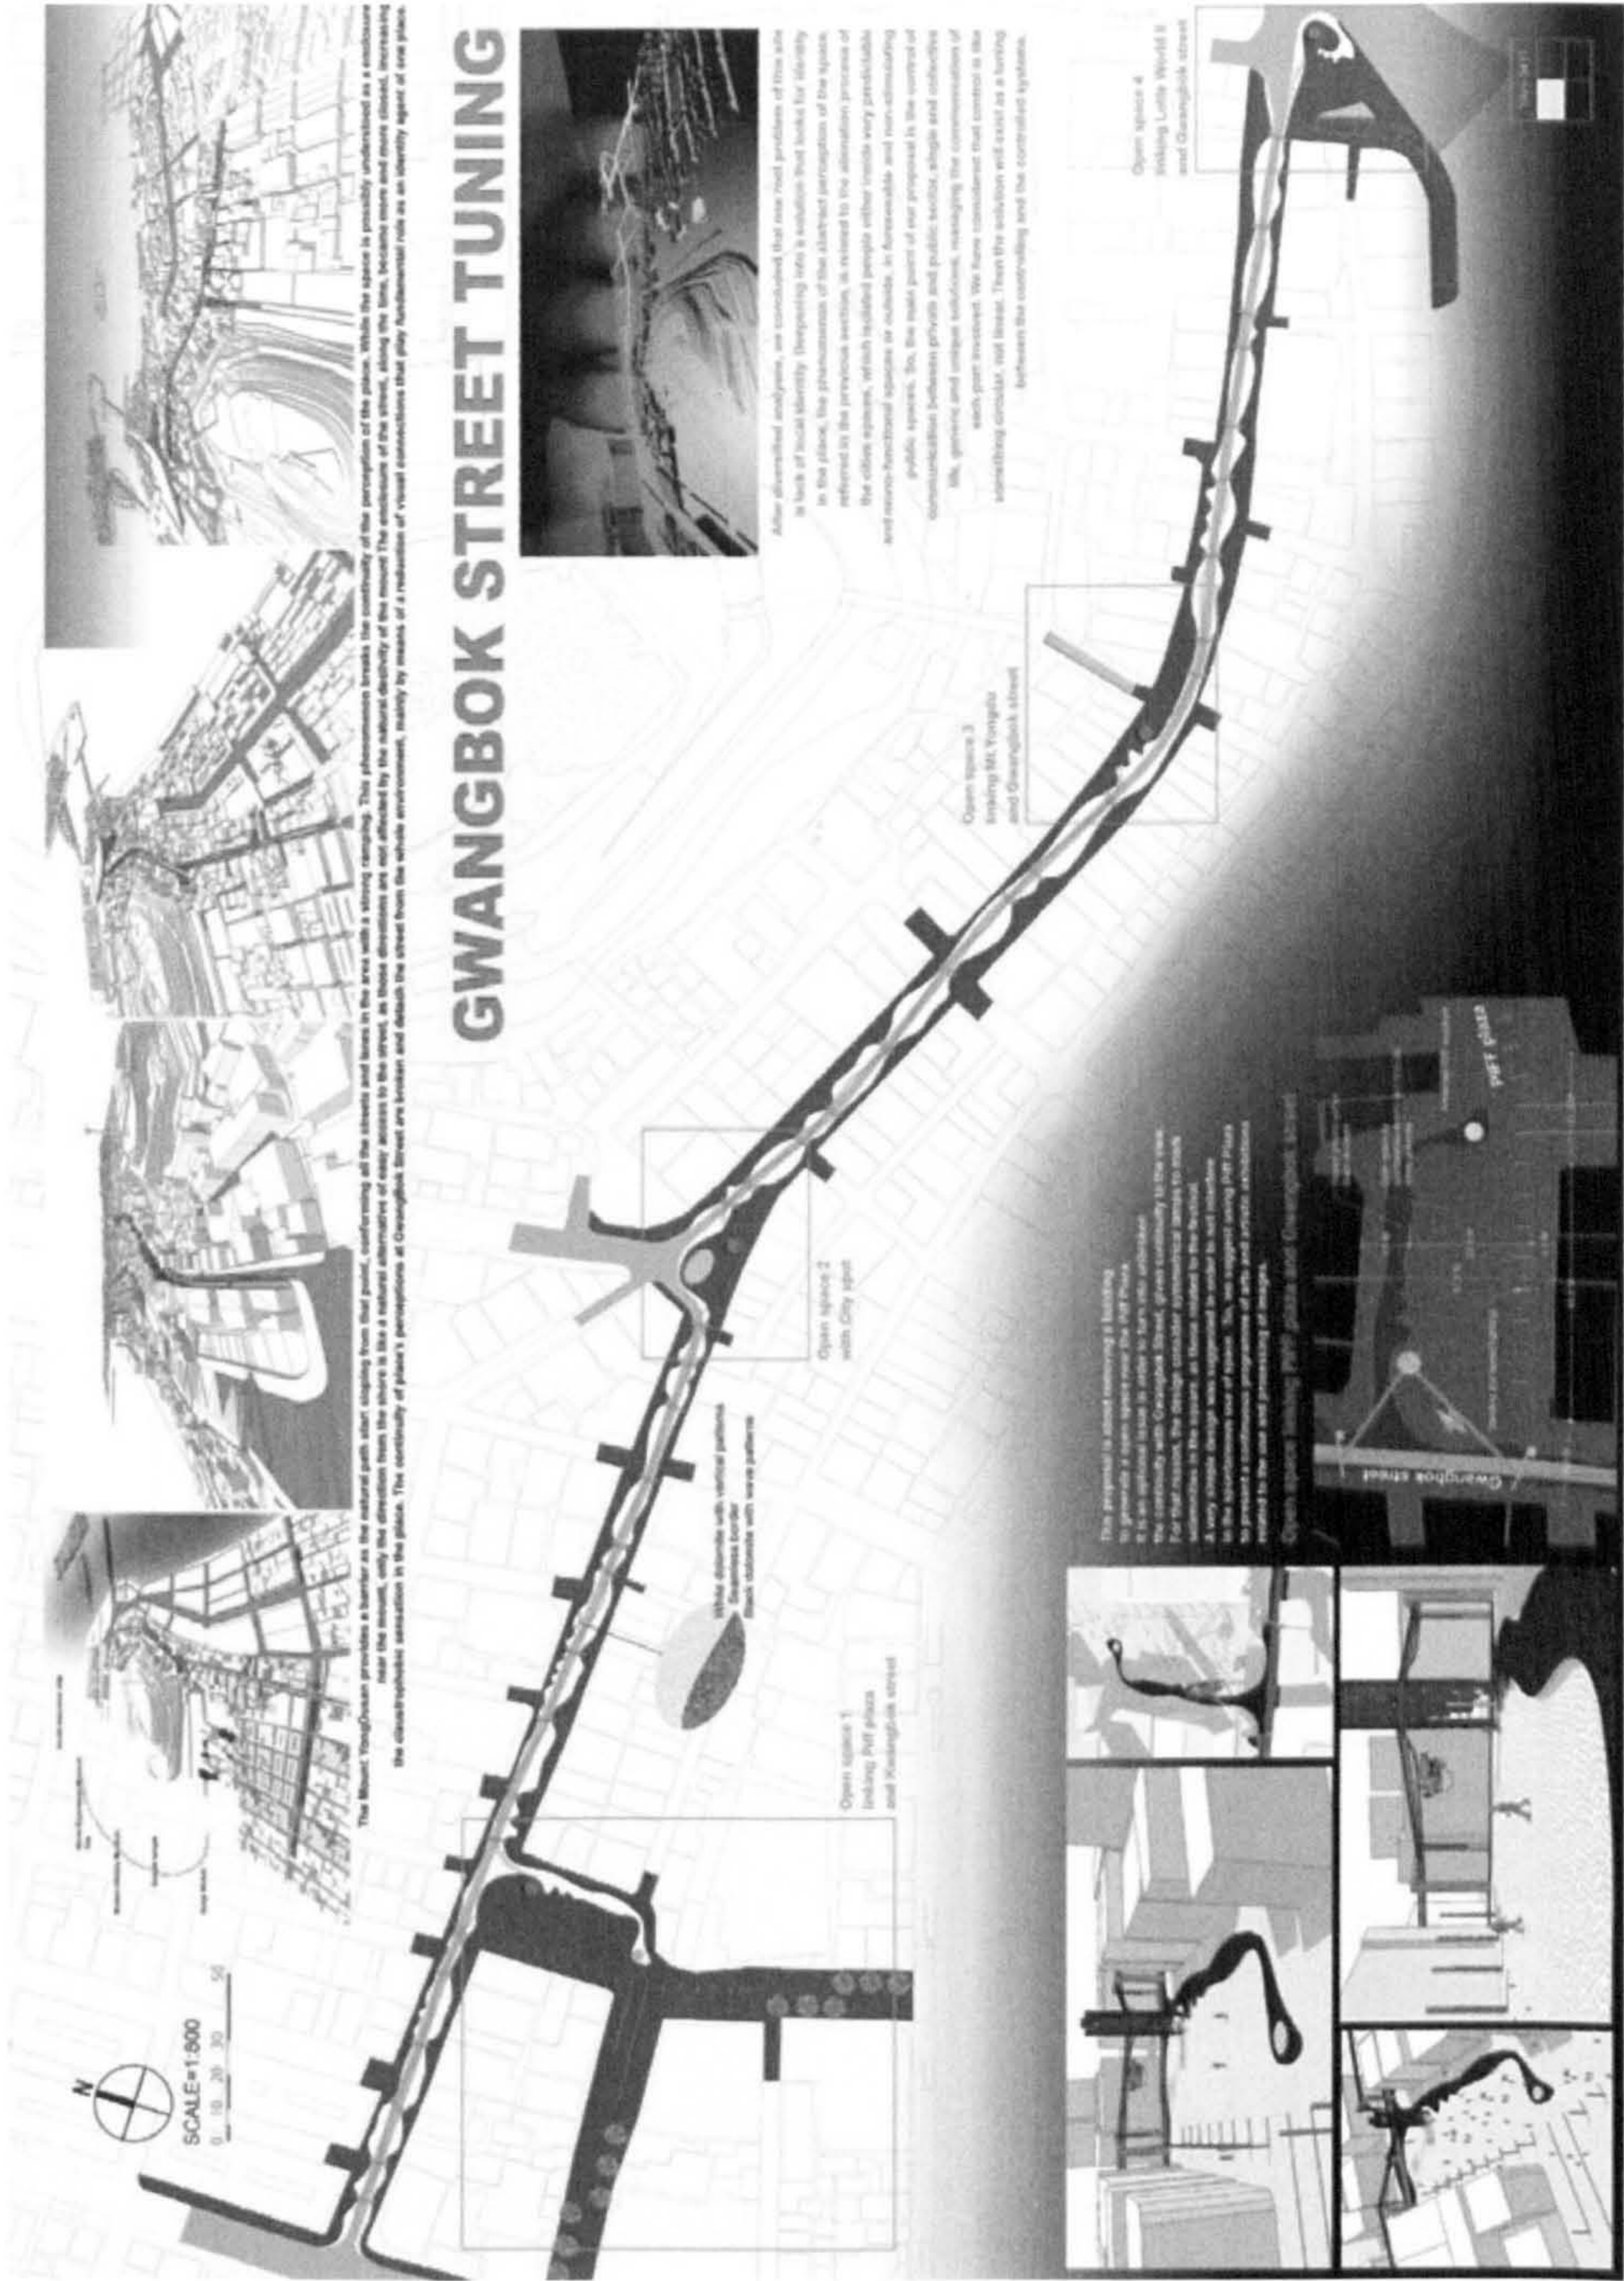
First page of drawings, contest to revitalization of Gwangbok Street and PIFF plaza, 2005.
